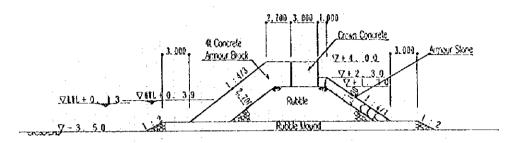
4- 19 Standard Cross Section of Breakwater Head (impermeable structure)
